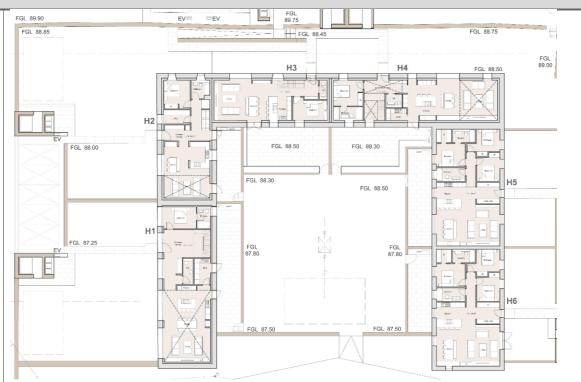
Proposed Plan – plan submitted showing the proposed divisions and layout of the converted steading.
